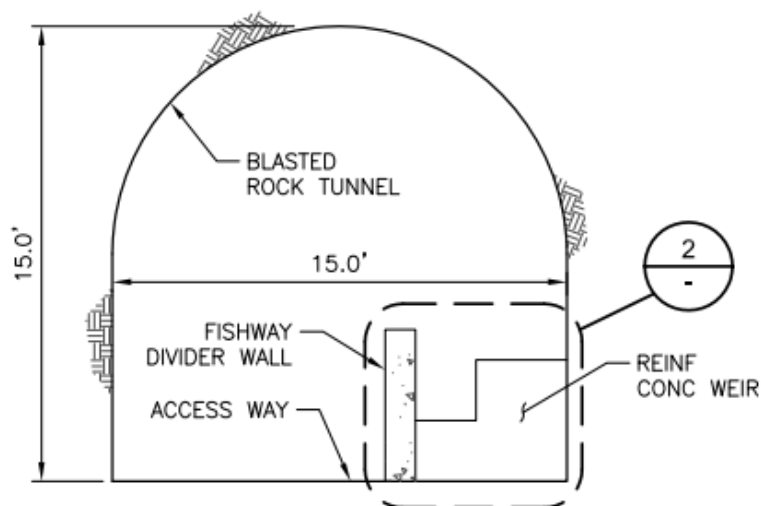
Cross-section view of the EFSFSR tunnel displaying the access way, fishway divider wall, and fishway
